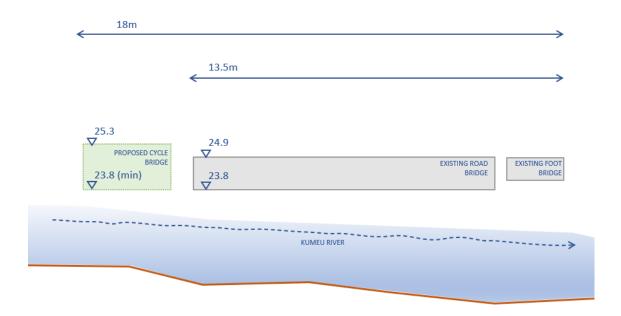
Indicative section and location of proposed and existing bridge structures (excludes handrails, foundations and details)
